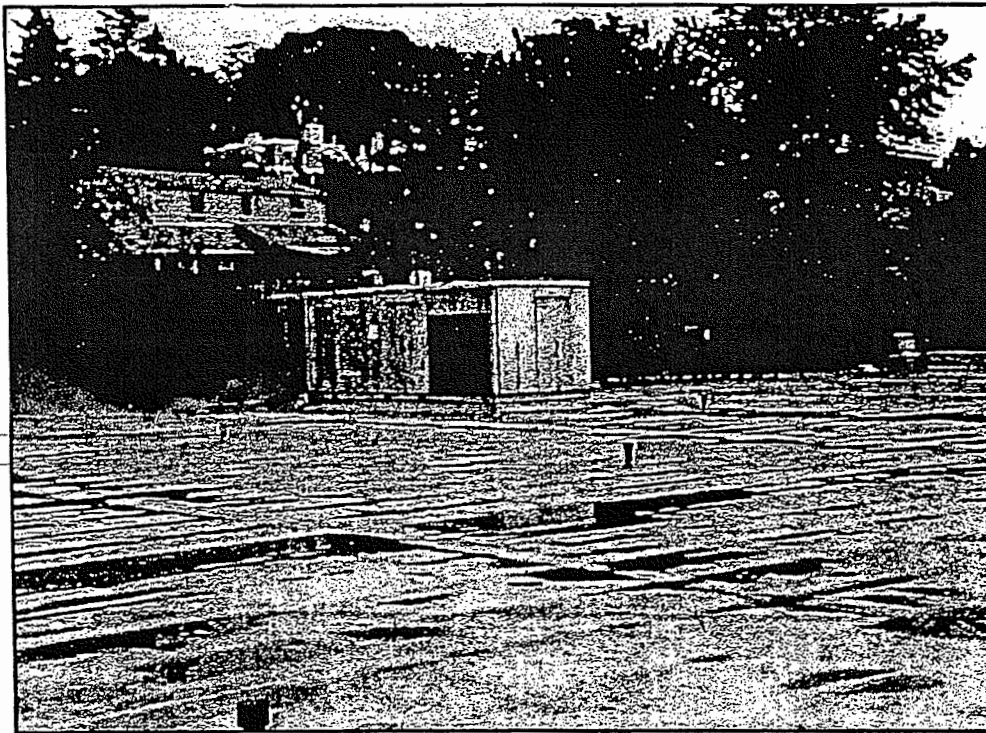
Roof-mounted electrical HVAC unit, vacant supermarket.
